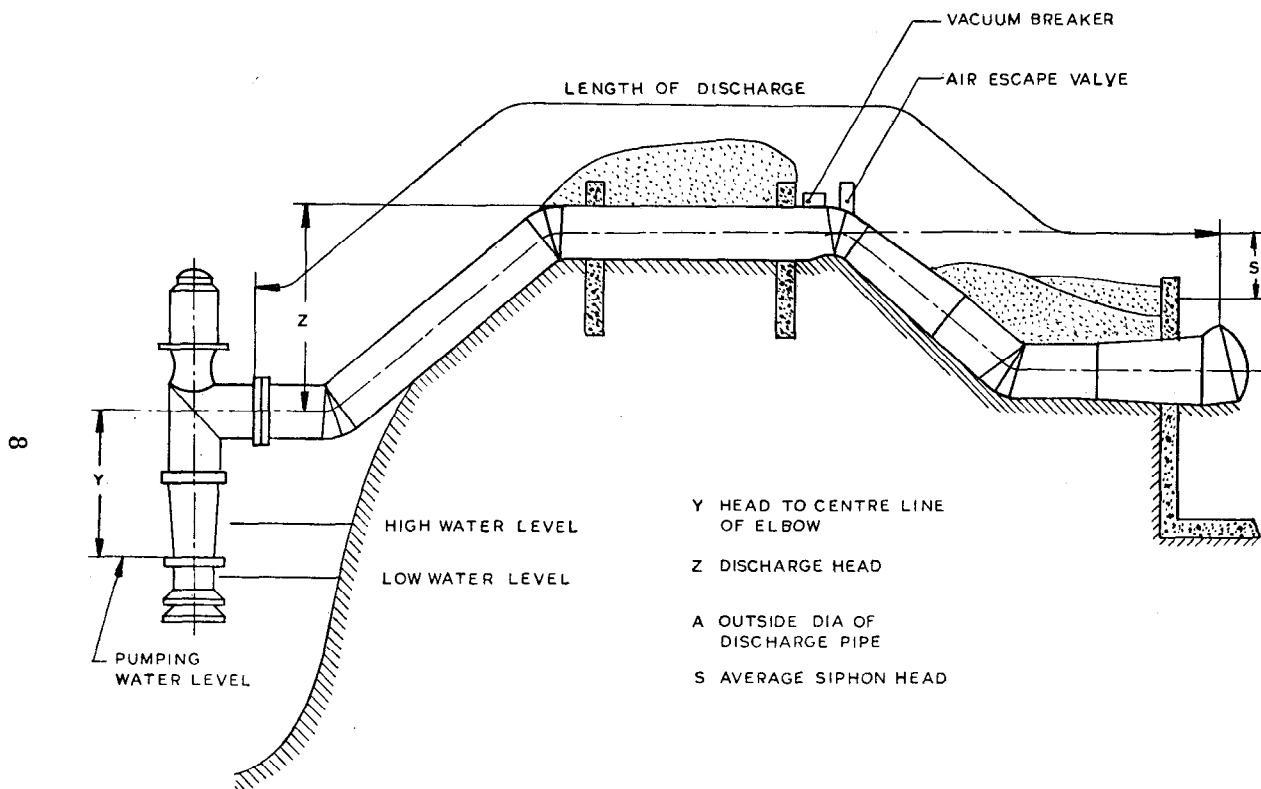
TYPICAL DRAINAGE PUMP INSTALLATIONS
